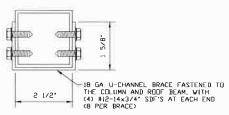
DETAIL FOR HEIGHTS 15'-0' < TO < 16'-0'
